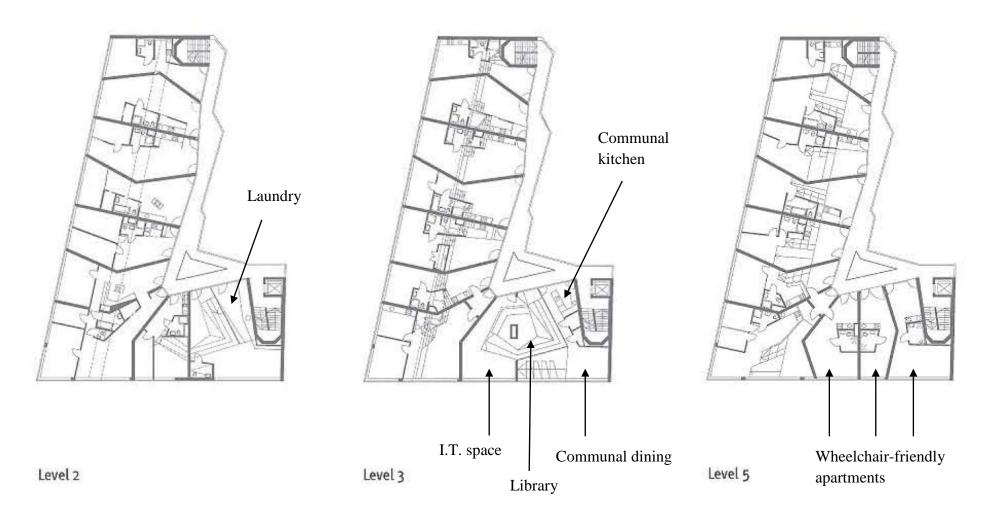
Miss Sargfrabrik. 2nd floor, 3rd floor and fifth floor plans. Annotations added by author.
